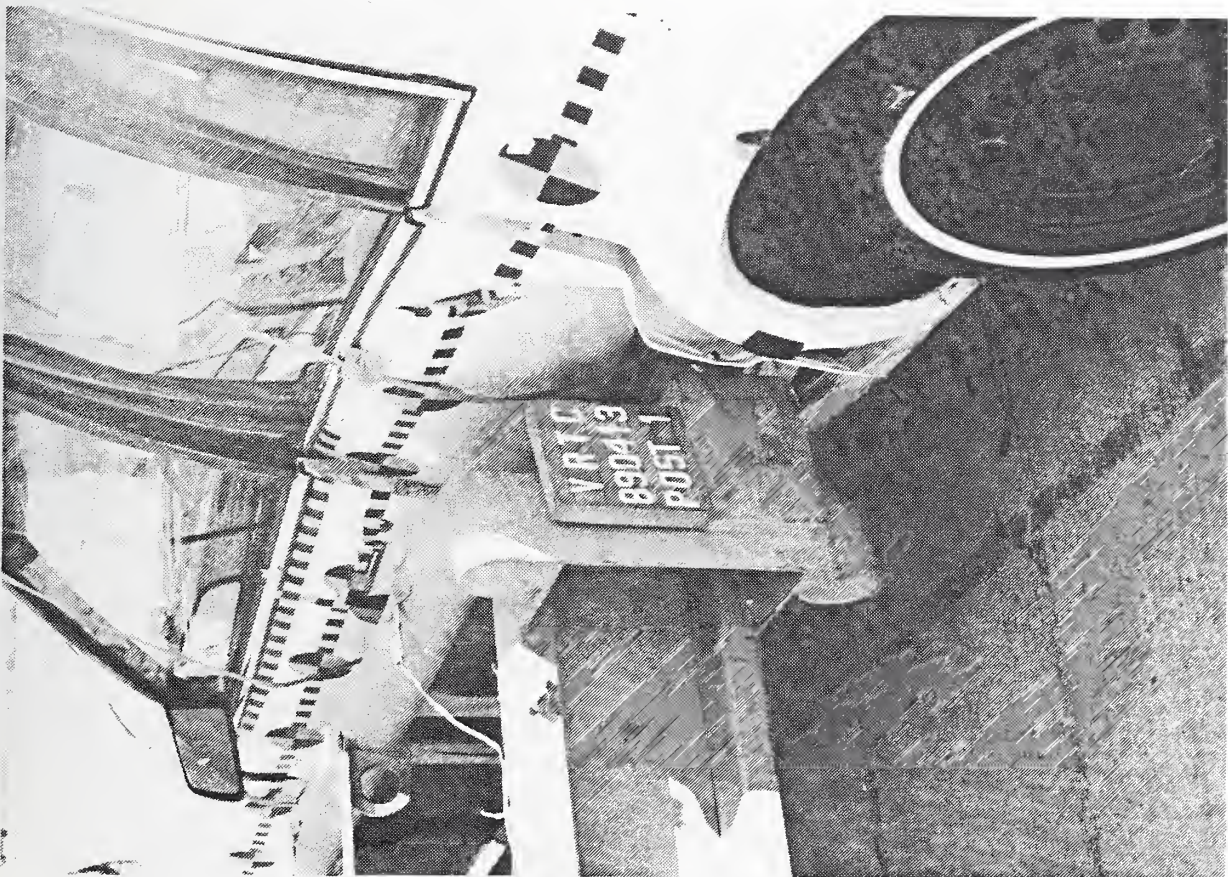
POST-TEST CLOSEUP LEFT REAR VIEW
